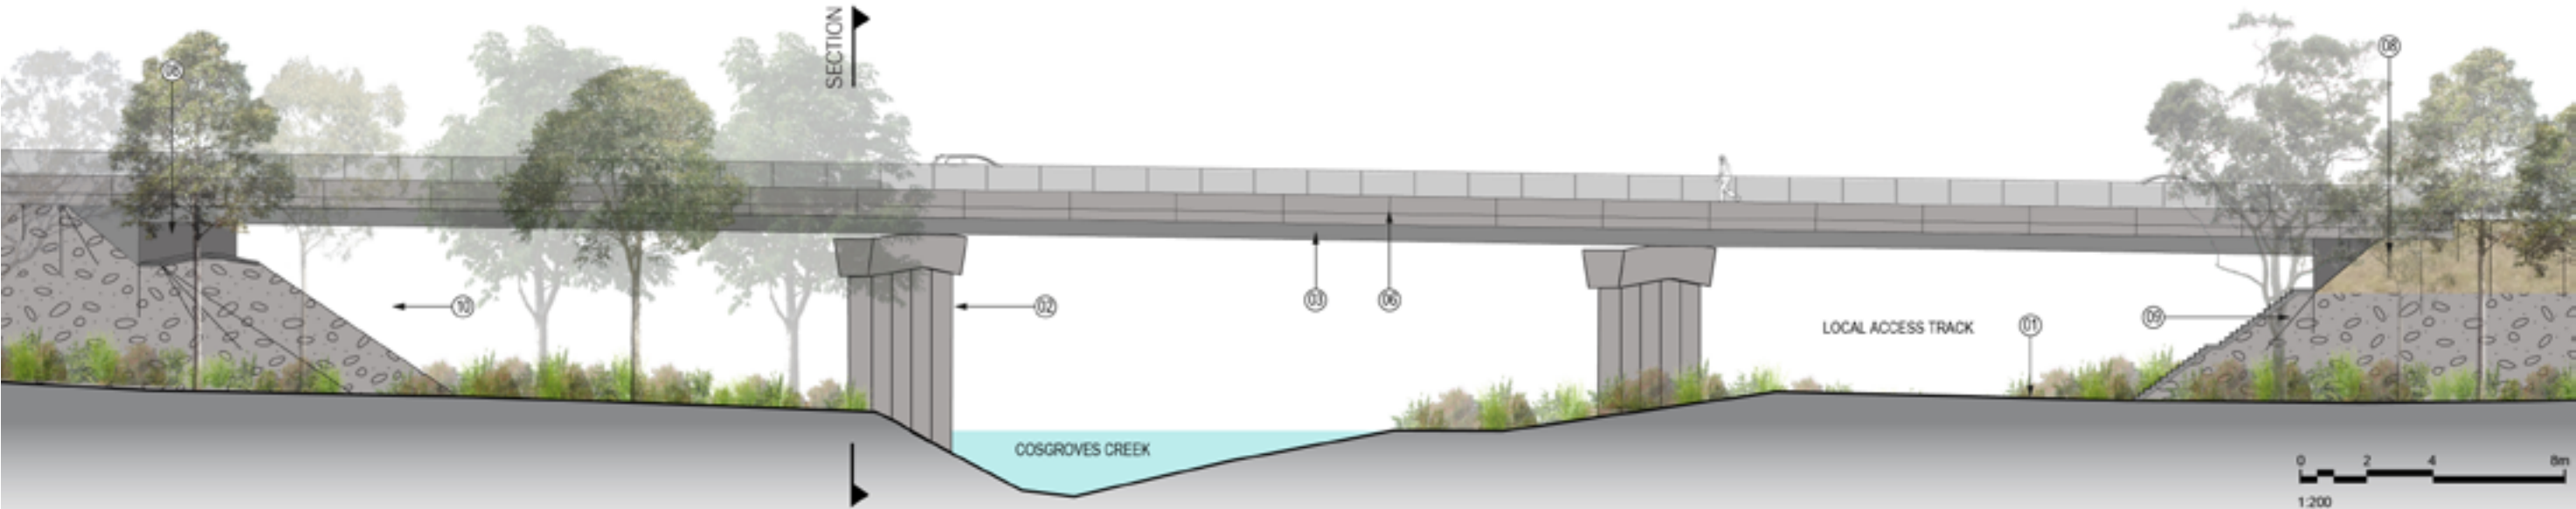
Elevation - BR02 - Bridge over Cosgroves Creek
